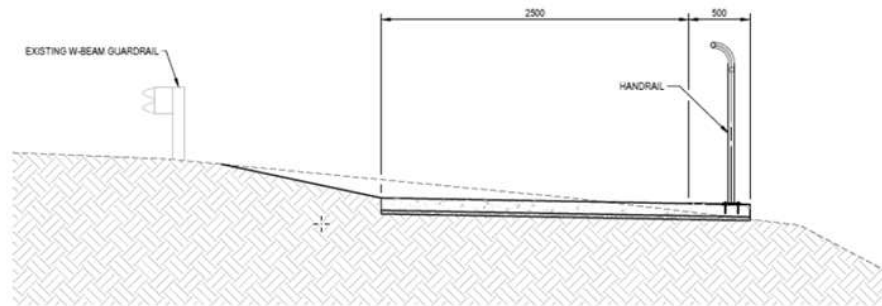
Typical cross-section where there is a verge behind guardrail (from northern extent of Stage 2 works to southern boundary of golf course)
